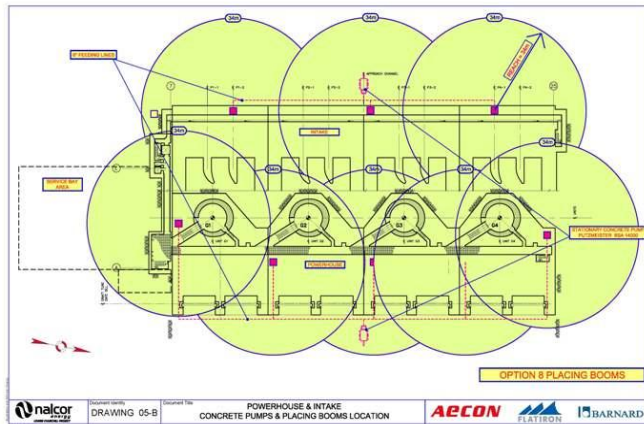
Powerhouse & Intake- Concrete Pumps & Placing Booms Location
